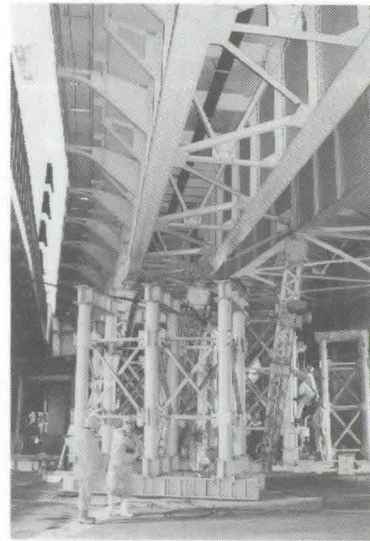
Tilting rocker piers (near Sannomiya Station, Tokaido Main Line)
